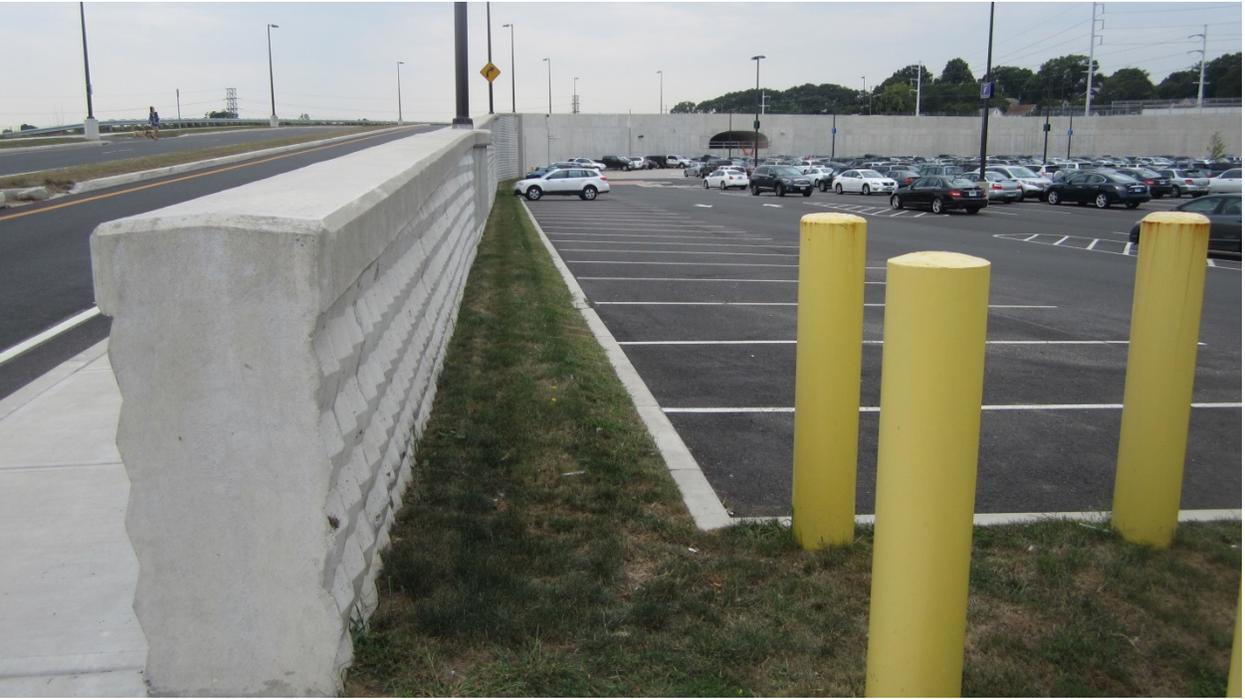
RETAINING WALL AT ENTRANCE TO METRO CENTER PARKING LOT
